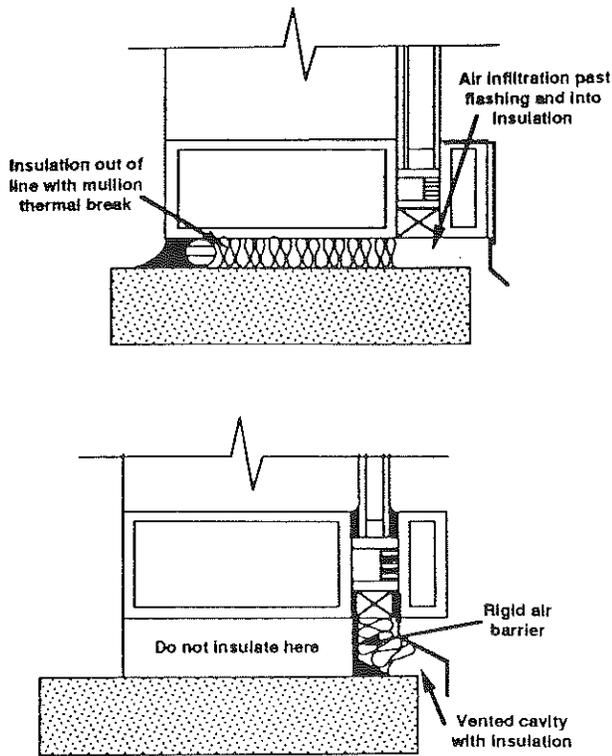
Curtain wall/grade connection (Quirouette 1983).
